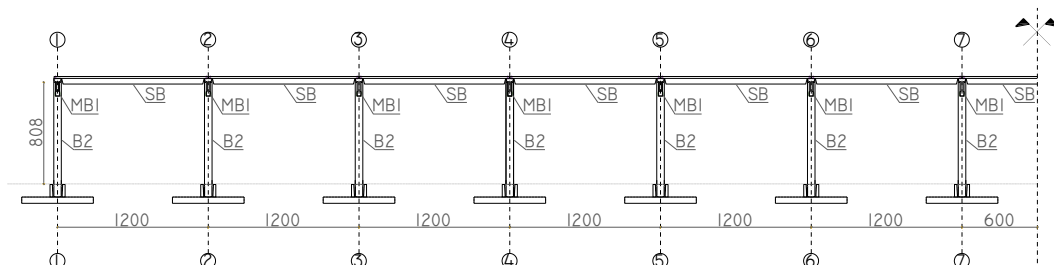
Longitudinal cross-section of industrial hall prototype structure
